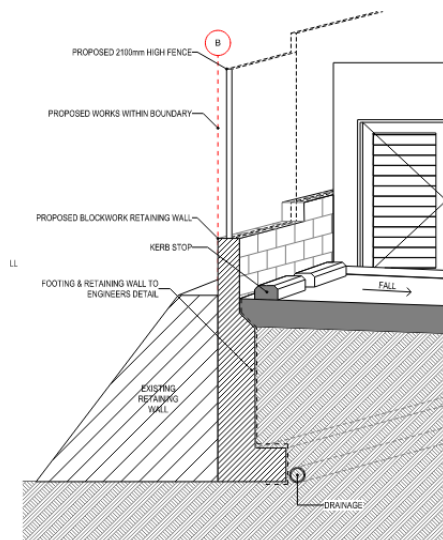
proposed retaining along the northern boundary at the western portion of the site (source: EJE Architects, 01/12/2023)
